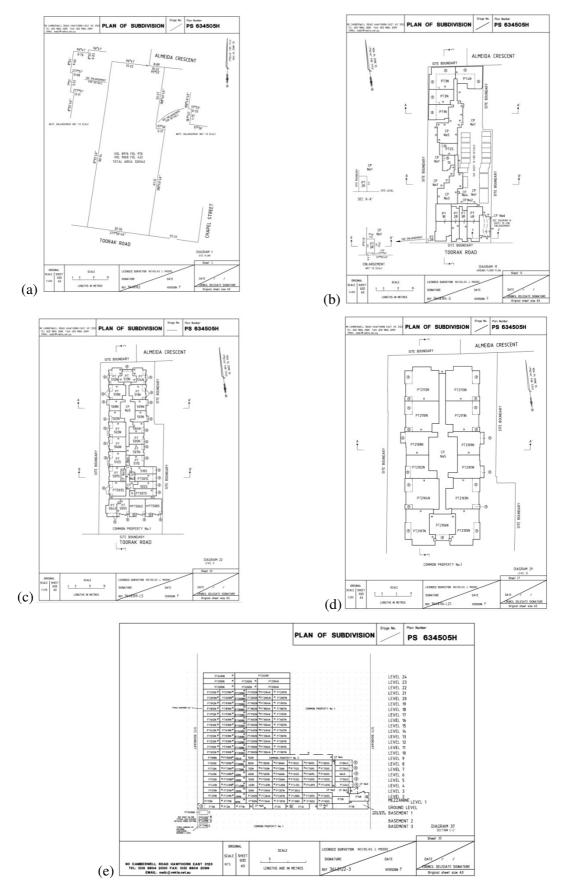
Some pages of the subdivision plan of the ILK South Yarra; (a) Land parcel boundaries; (b) Ground floor plan; (c) Level 5 floor plan; (d) Level 21 floor plan; (e) Cross-section C-C'.
